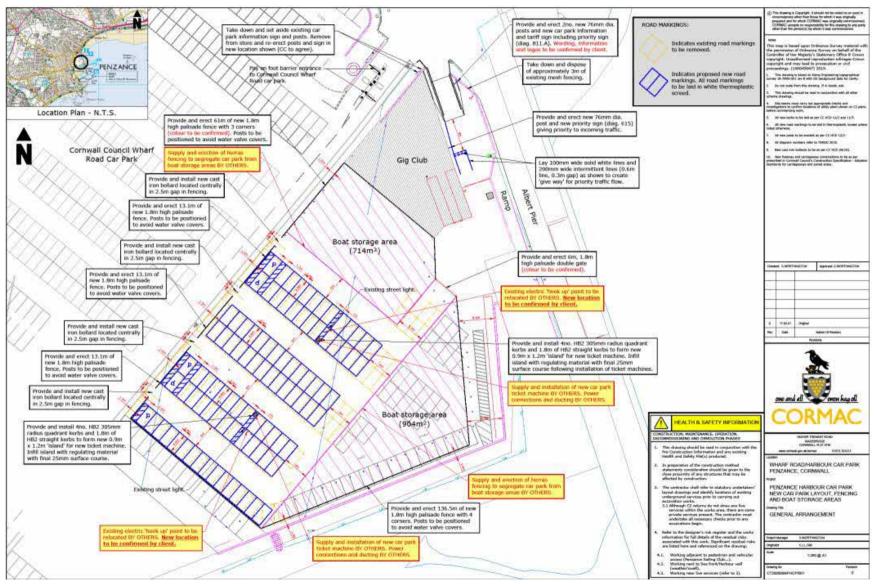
Proposal plan for Area 2 showing reconfiguration and proposed fencing.
